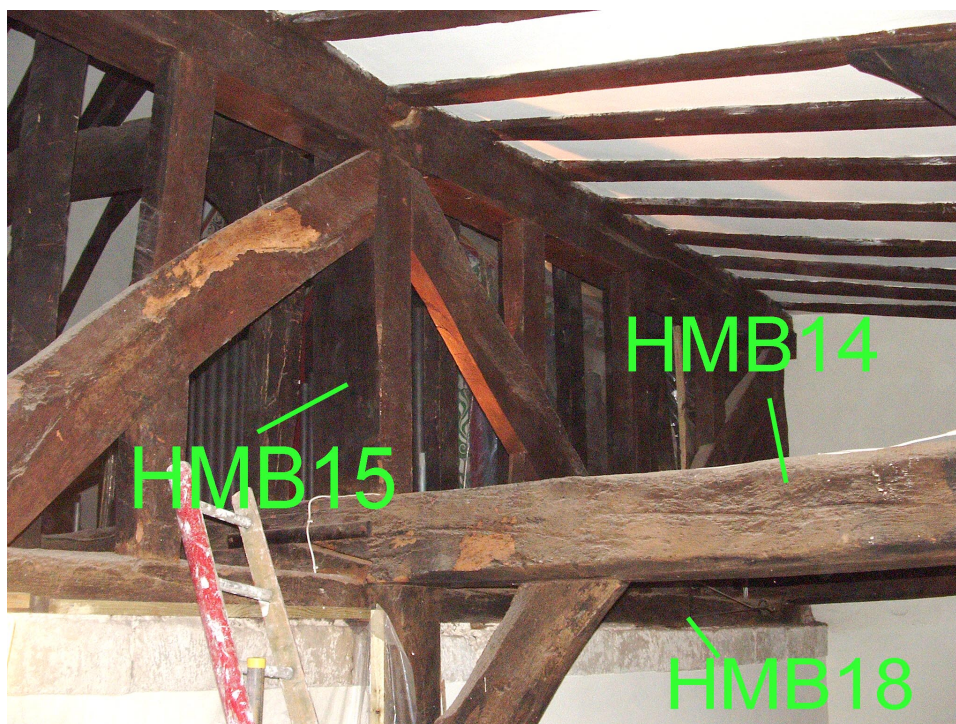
Inner north aisle roof, looking south-west towards the inner nave and organ, showing the timbers sampled
